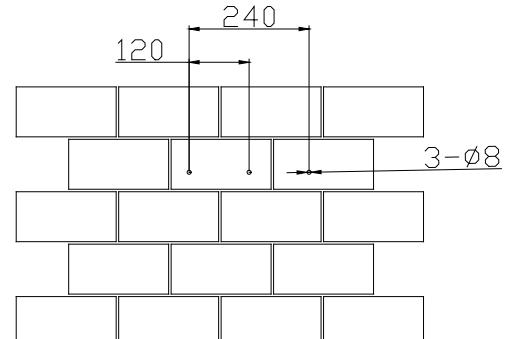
Drill hole dimensions of R5-7K/8K-S2
